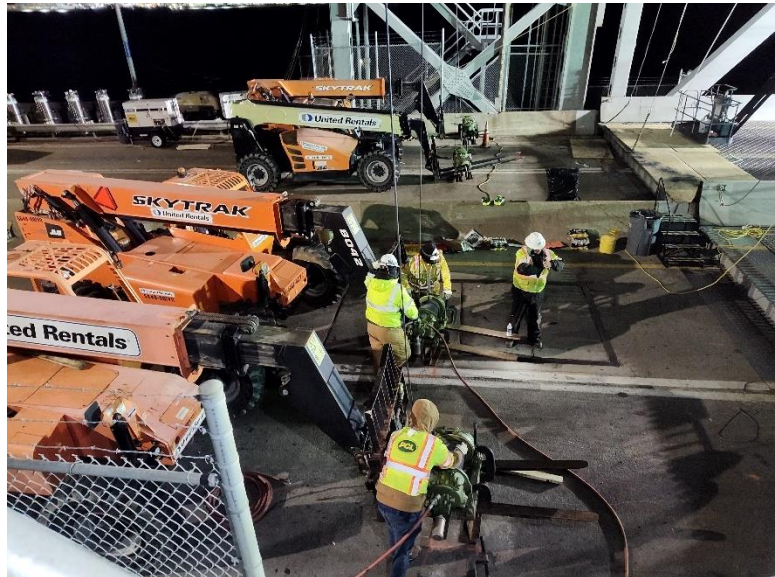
Four winches mounted to forklifts at the roadway level, one per counterweight sheave.
